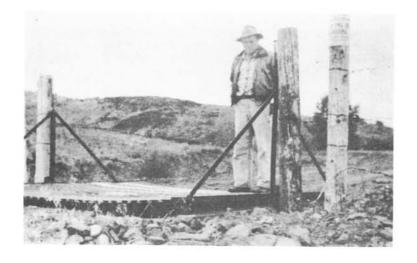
Close up of typical pit type cattle guard above. Deck and "A" frames are constructed of 2" pipe. "A" frame is all welded construction. Pit frame work is creosoted timber.
